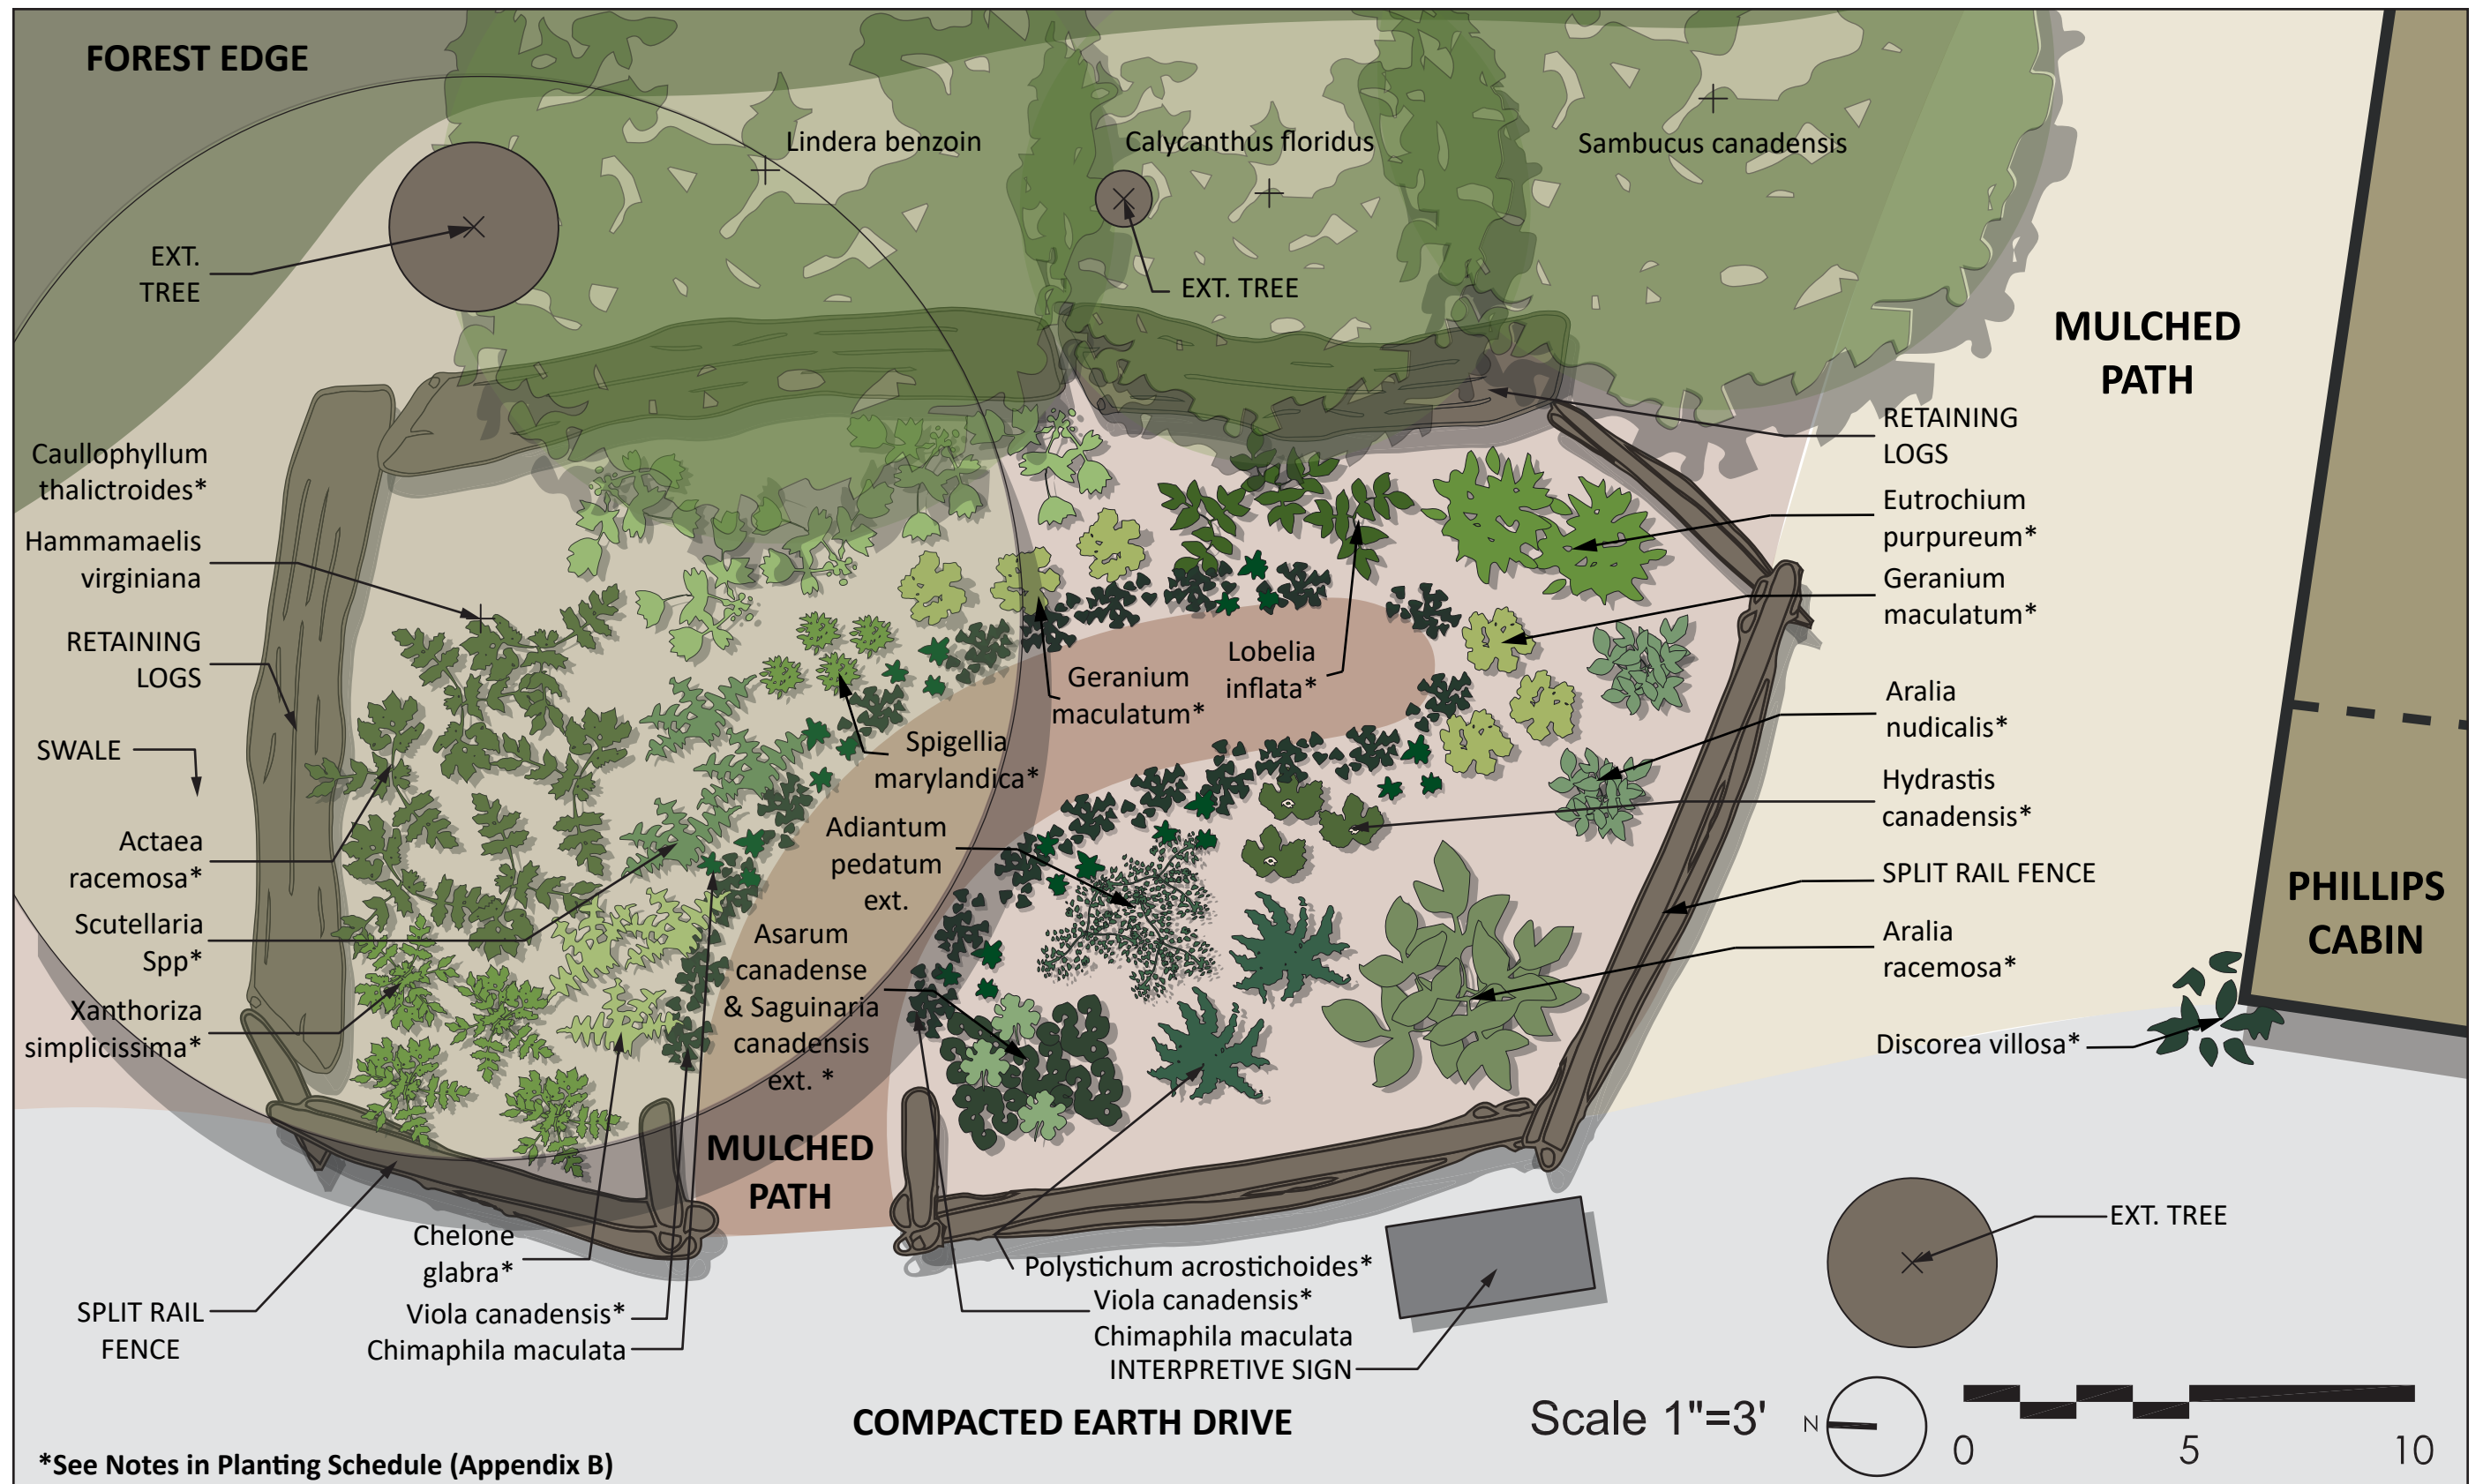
Revised Planting Plan Plot 1 (Image by author)
